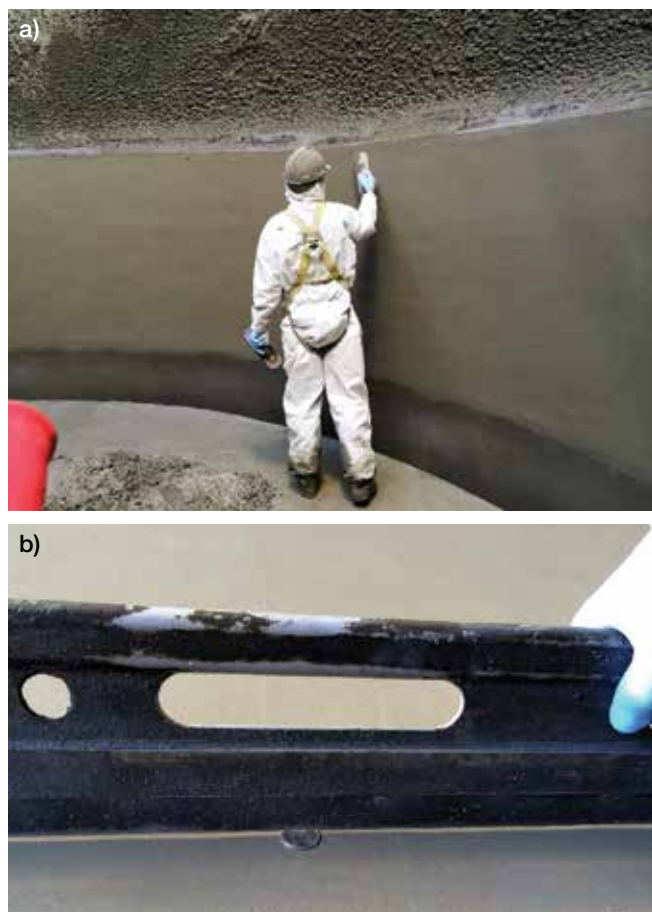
(a) Steel trowel finishing; and (b) checked finish tolerance with a Canadian quarter, which is less than 2 mm thick
